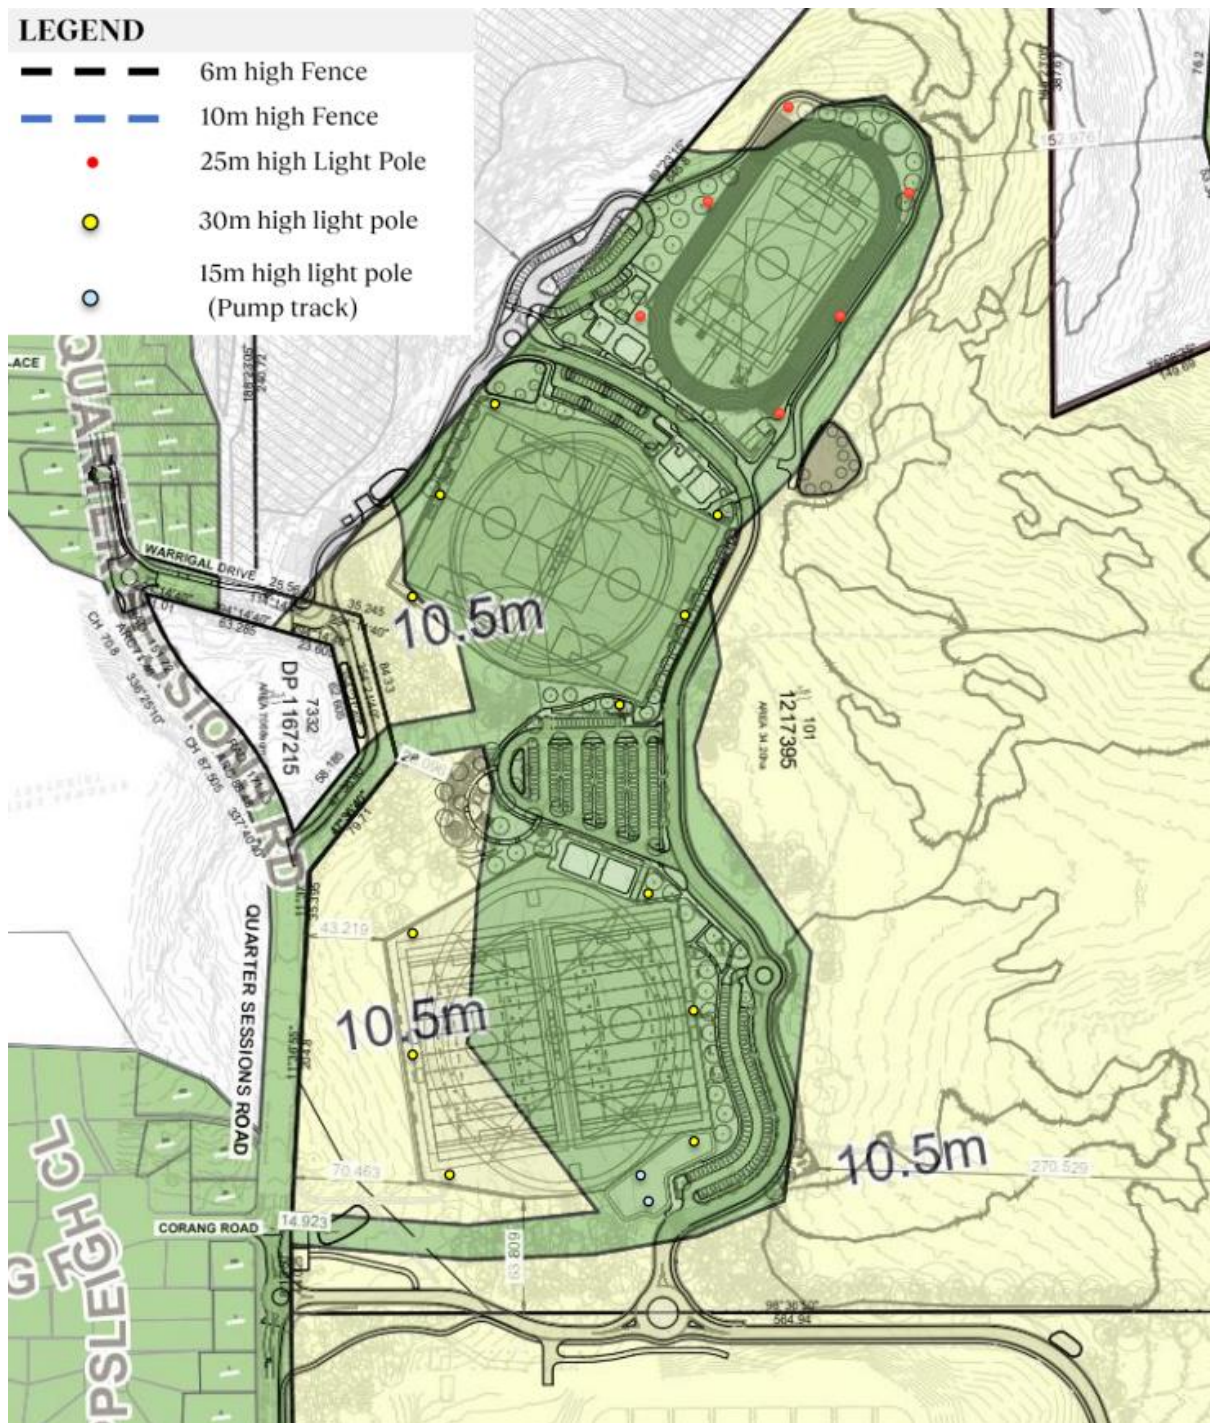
Extract of Proposed Site Plan and Height Variations (Source: CI4.6 Request)
